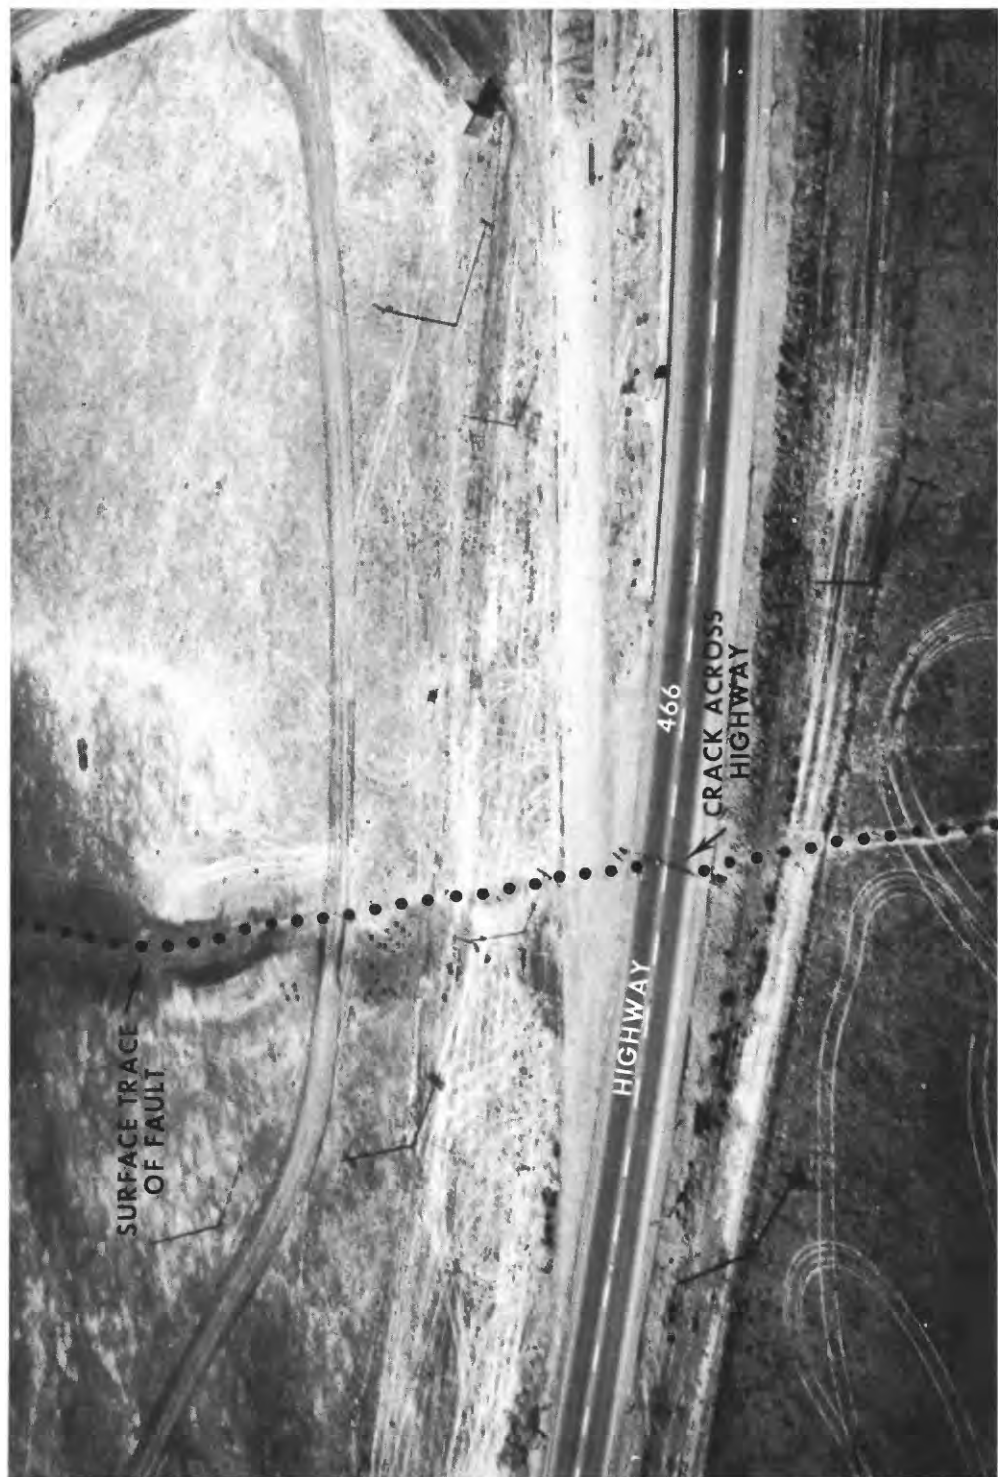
View looking northward along San Andreas fault, showing locations of crack in Highway 466, damaged bridge, and new surface cracking.
